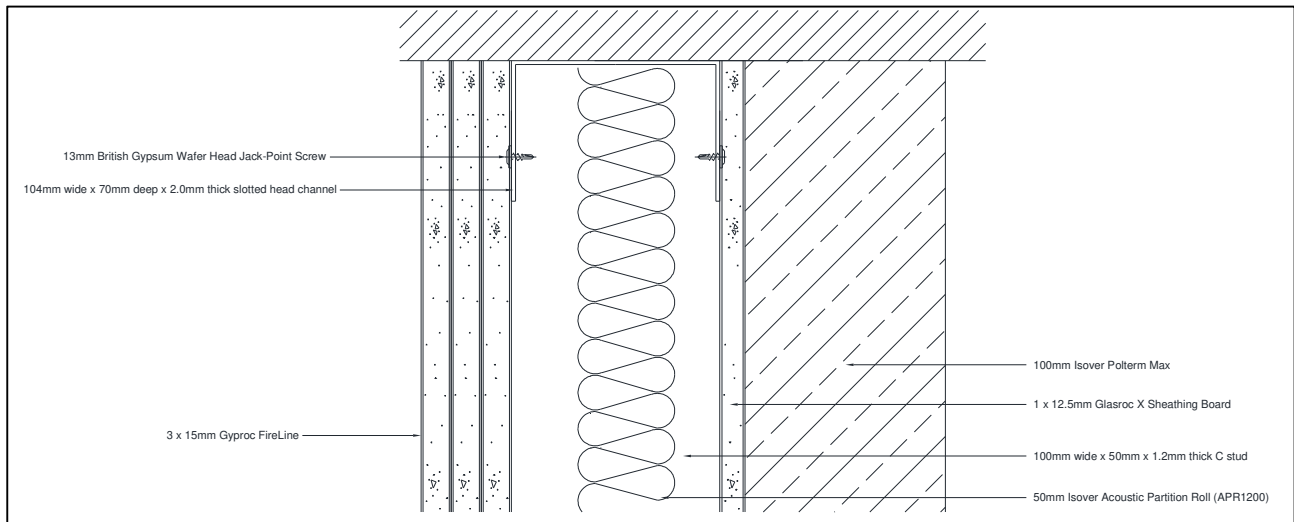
Horizontal cross section view with Isover Polterm Max installed.
